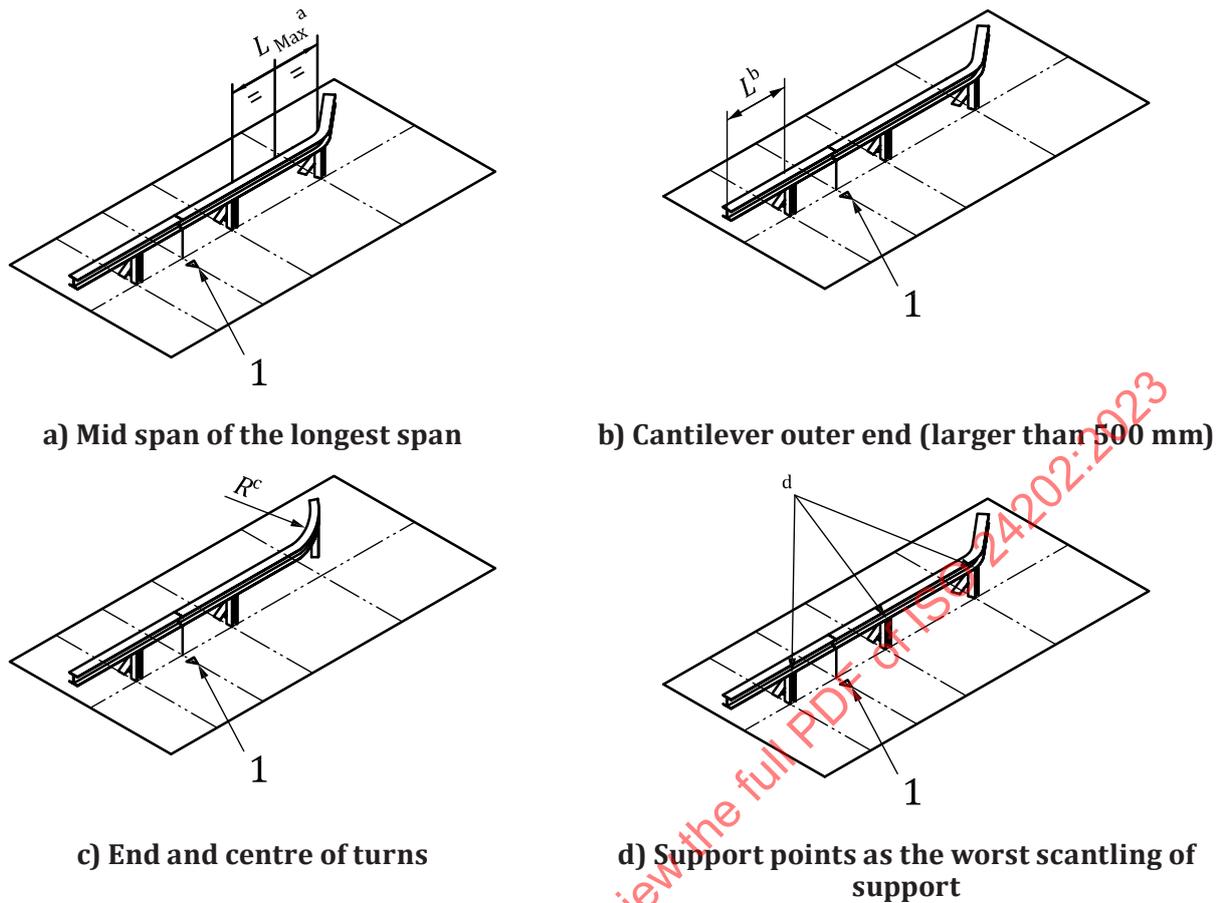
Curved monorail beam4.12 Arrangement for installation of hoists and trolley
